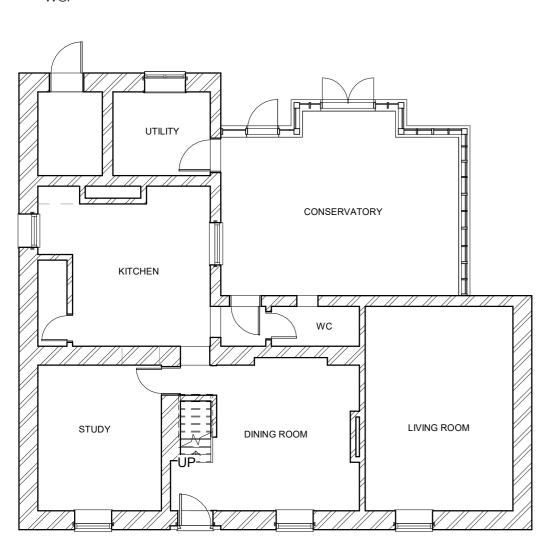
Existing Ground Floor Plan, not to scale © Lang Architecture
